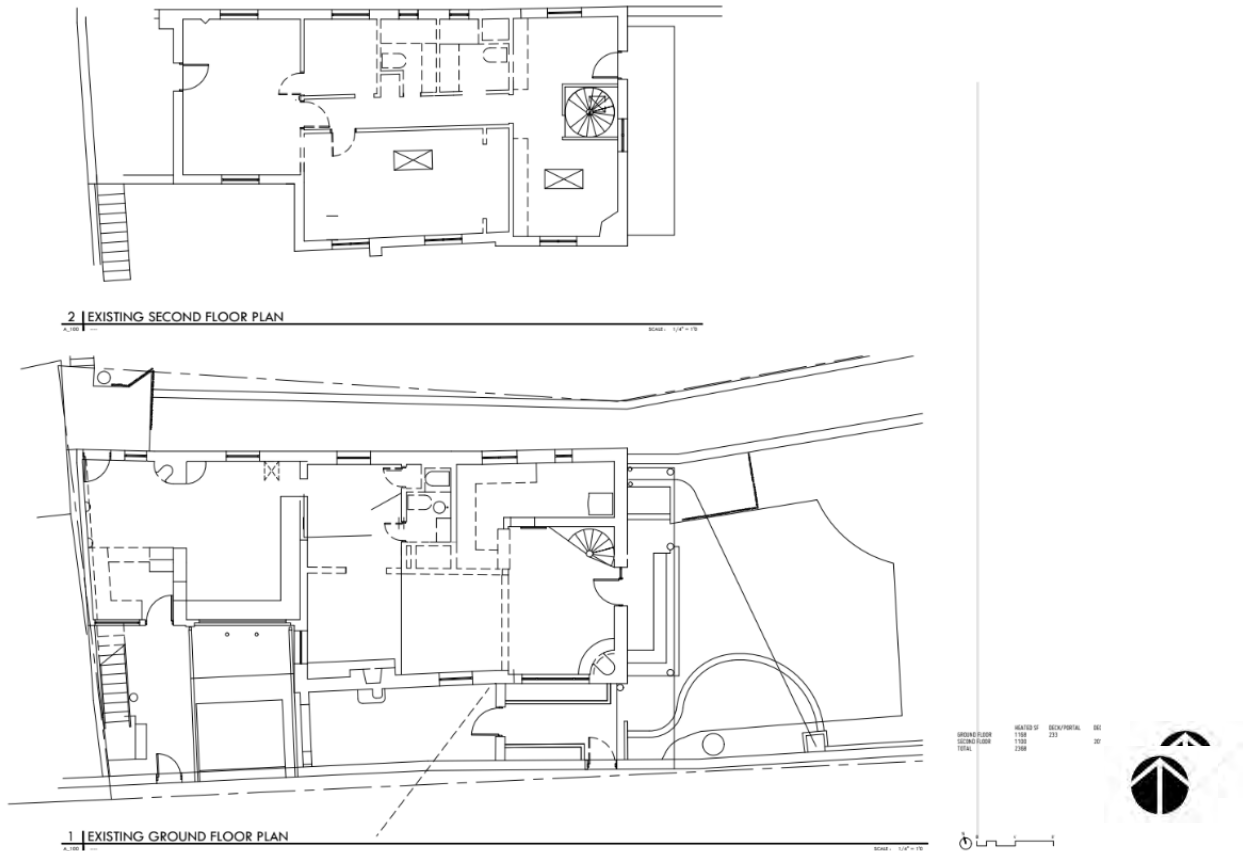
Existing floor plans. Courtesy of Thomas Gifford, Architect.
